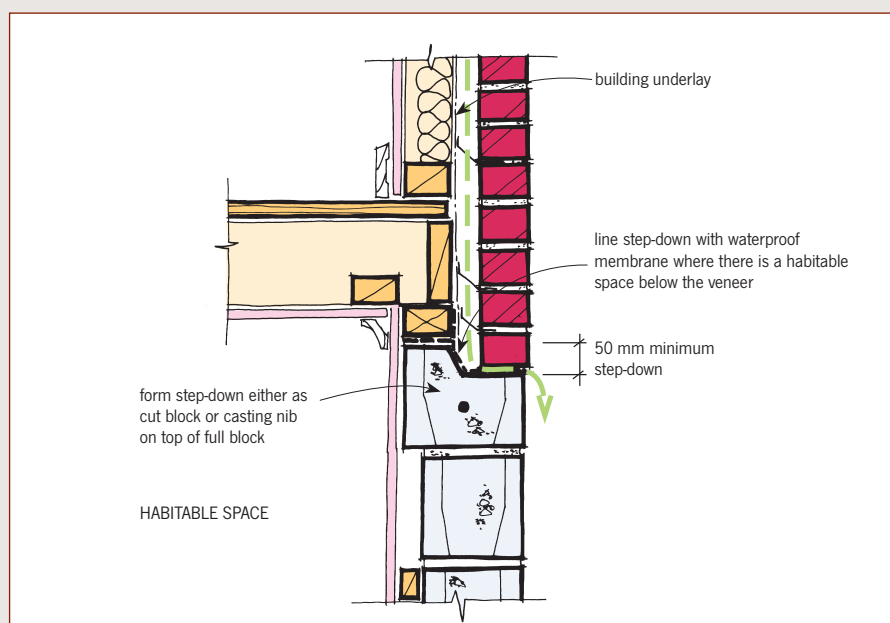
Correct construction details for masonry veneer on a blocked wall with a habitable space below.
